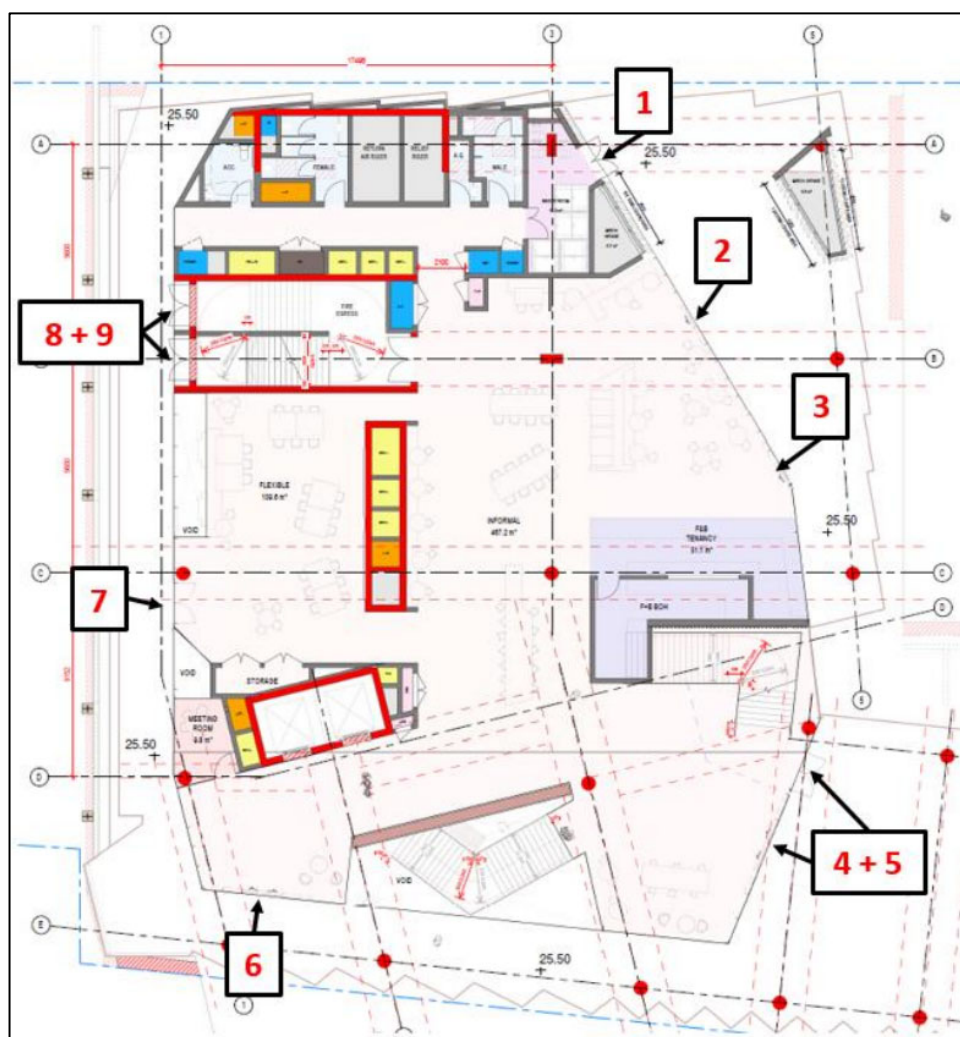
| Proposed entrances to the building (Source: Applicant's Flood Assessment)
